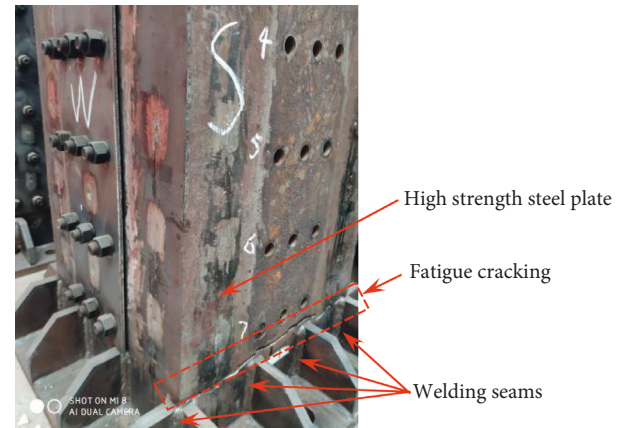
Fatigue cracking of the high-strength steel plate with welding seams under repeated loading.
